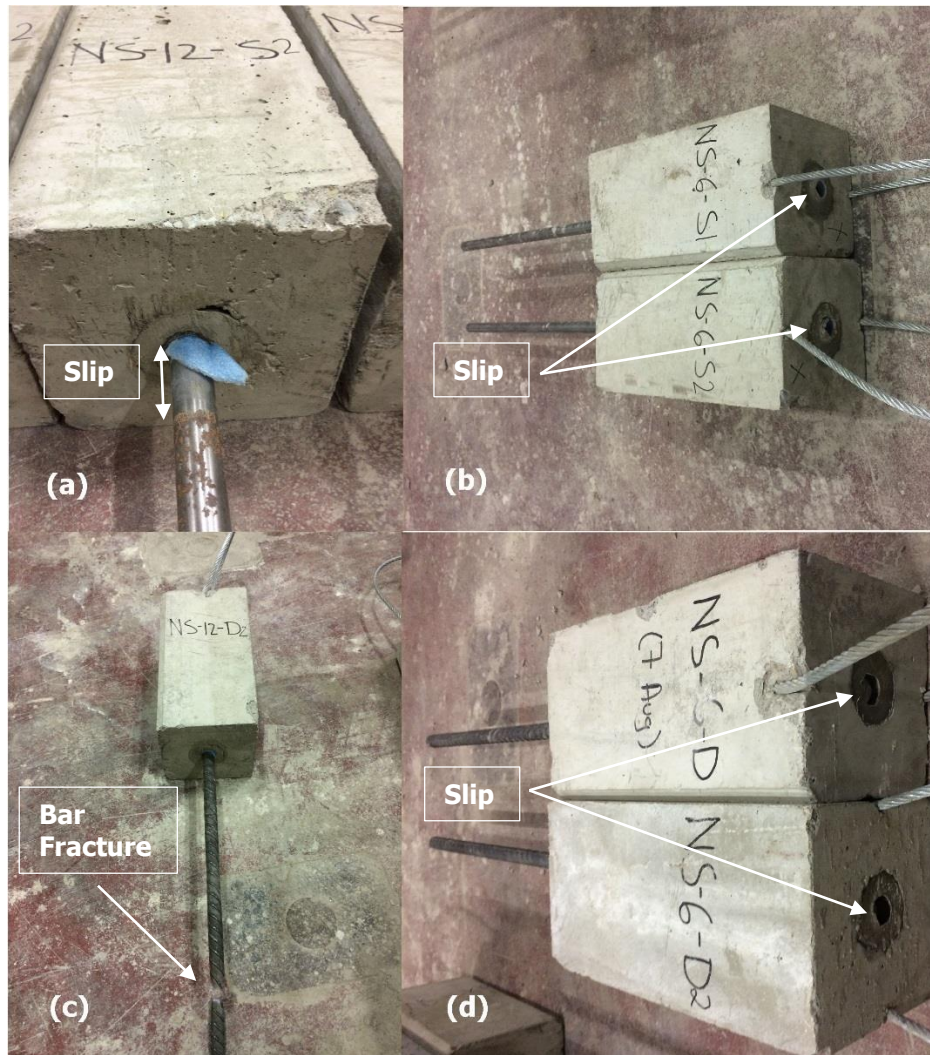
Specimen failure modes: (a) NS-12-S2; (b) 12d_b smooth specimens; (c) bar fracture in the deformed 12d_b specimens; (d) slippage in the NS-6-D specimens
